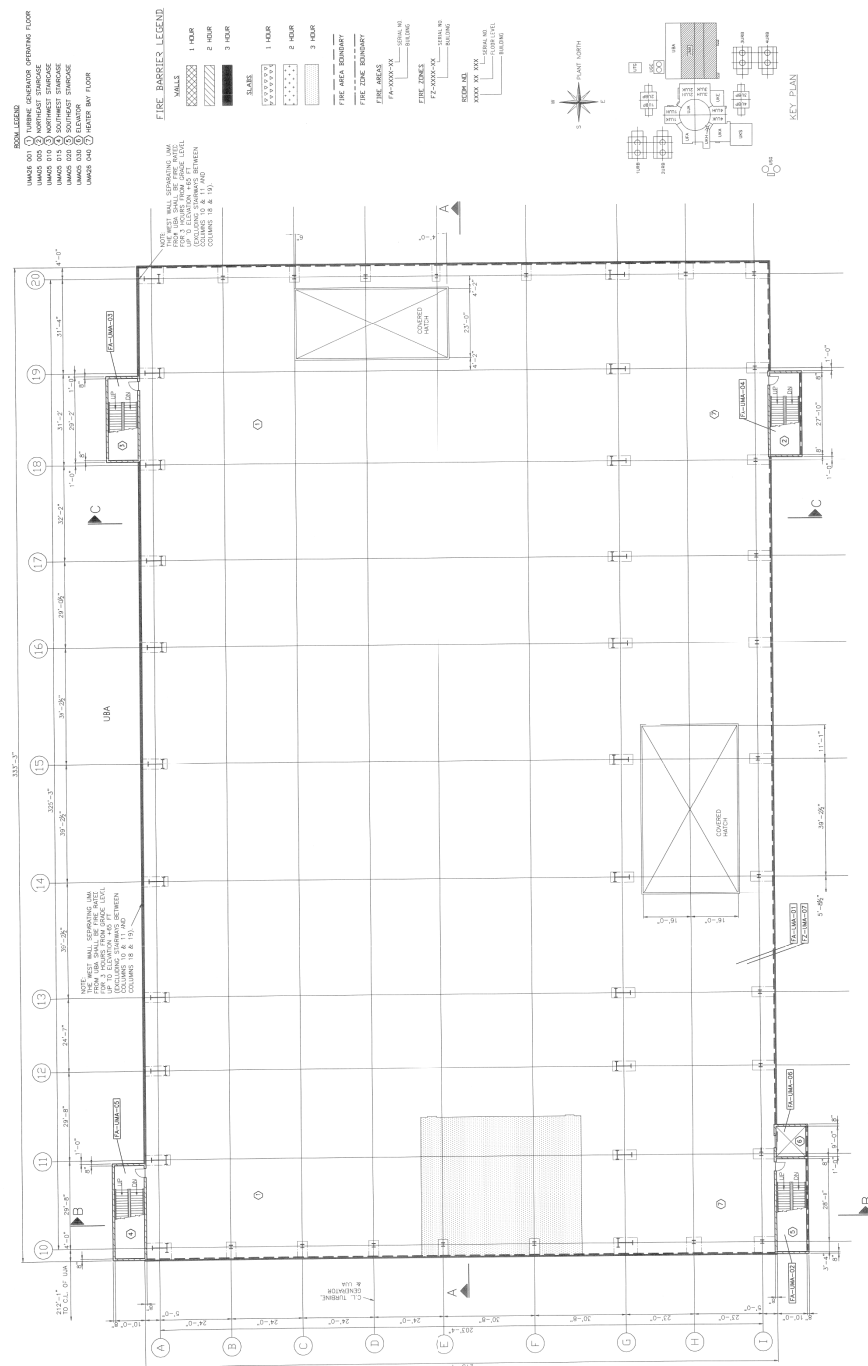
B-5—{CCNPP Unit 3 Fire Barrier Location, Turbine Building Plan at Elevation (-)43 Feet}
